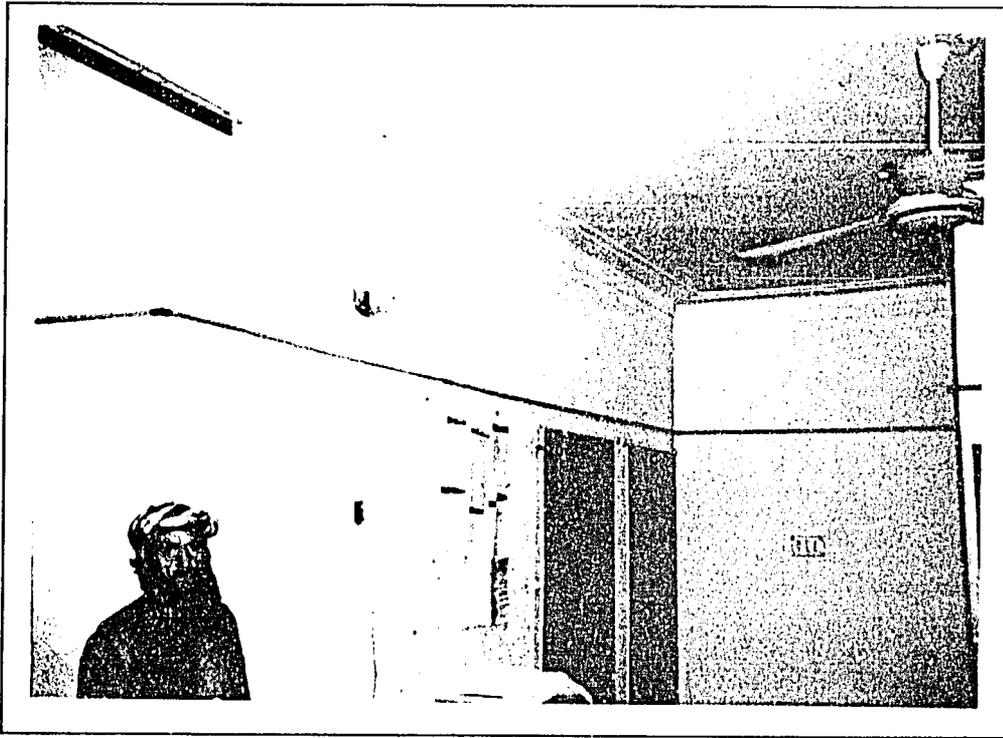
Quetta AID/REP Office Facility. Cable to be routed along existing conduit through curved archway.
